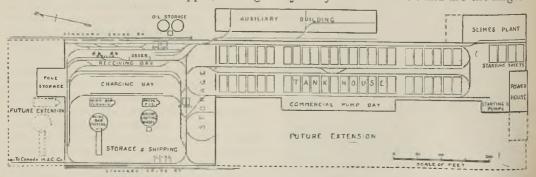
OUTLINE PLAN OF PLANT OF CANADIAN COPPER REFINERS, LTD.
